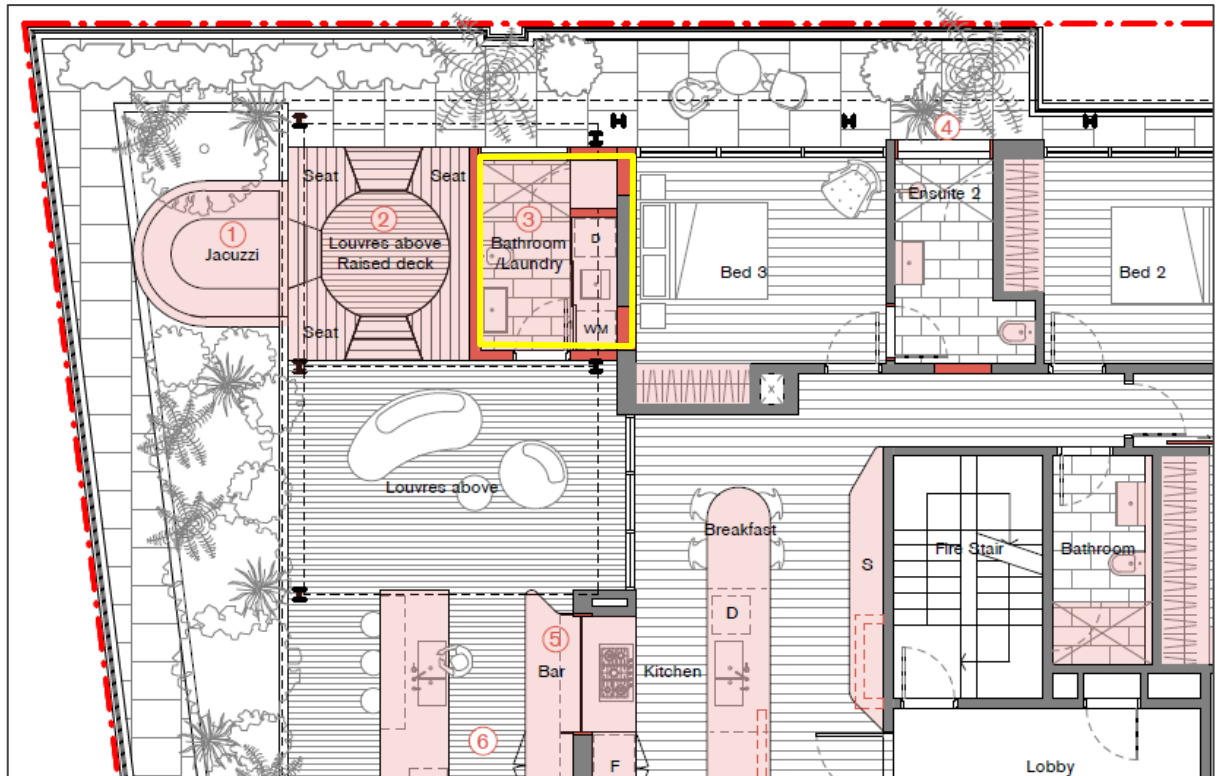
Extract of floor plan with additional GFA indicated in yellow.
